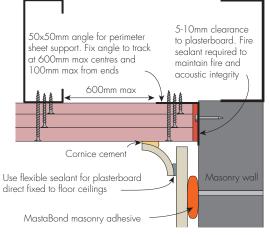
Fire Rated Ceiling to Masonry Wall Direct fixed to joist
